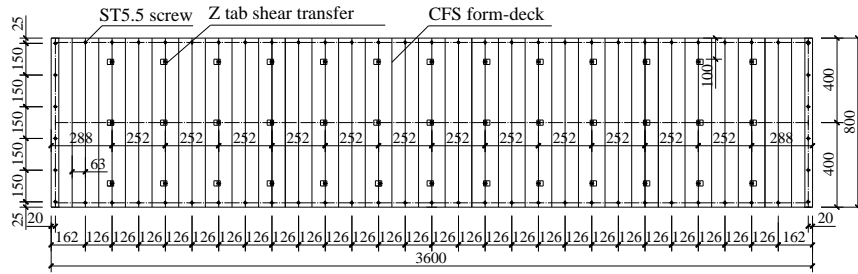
Connection between Z tab shear transfer and CFS form-deck (all dimensions in mm)
